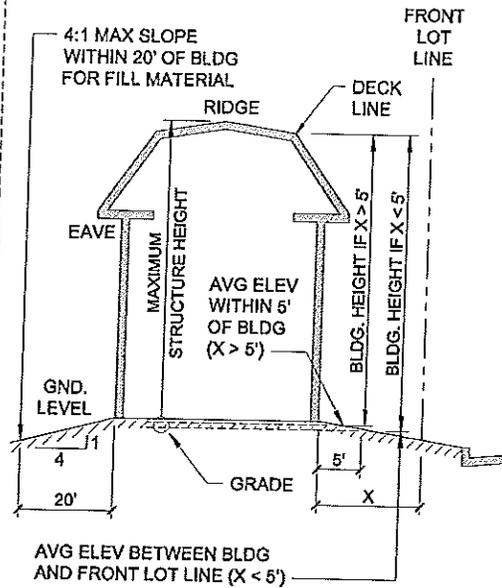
BUILDING HEIGHT AND MAXIMUM STRUCTURE HEIGHT
